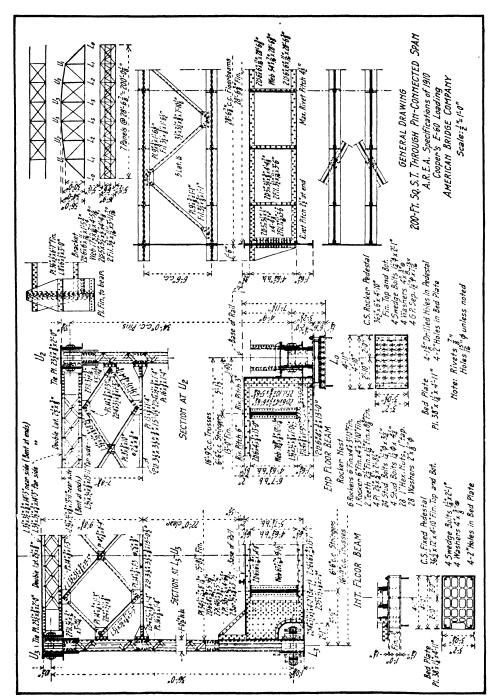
DESIGN FOR 200 FT. SPAN TRUSS RAILWAY BRIDGE.
